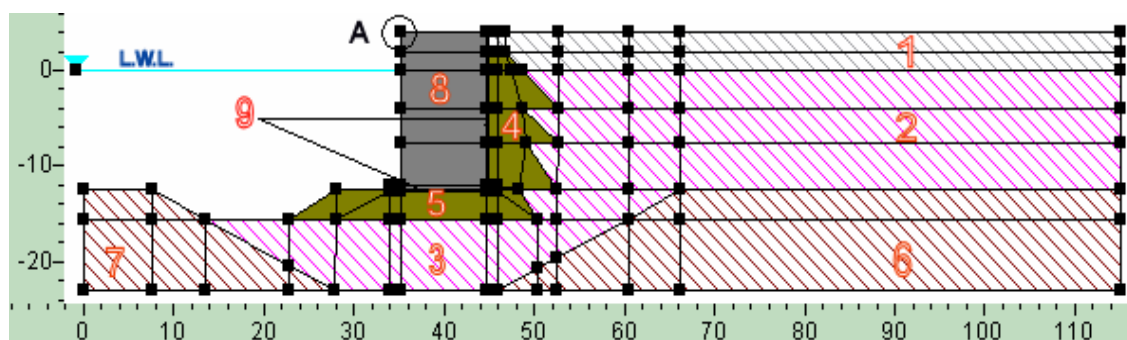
Geometry (in natural scale) and material zones of the Port Island PC1 quay wall; 1 is saturated backfill soil, 2&3 are submerged backfill and foundation soil, 4&5 are backfill and foundation rubble, 6&7 are alluvial clay, 8 is the caisson wall and 9 is the interface
